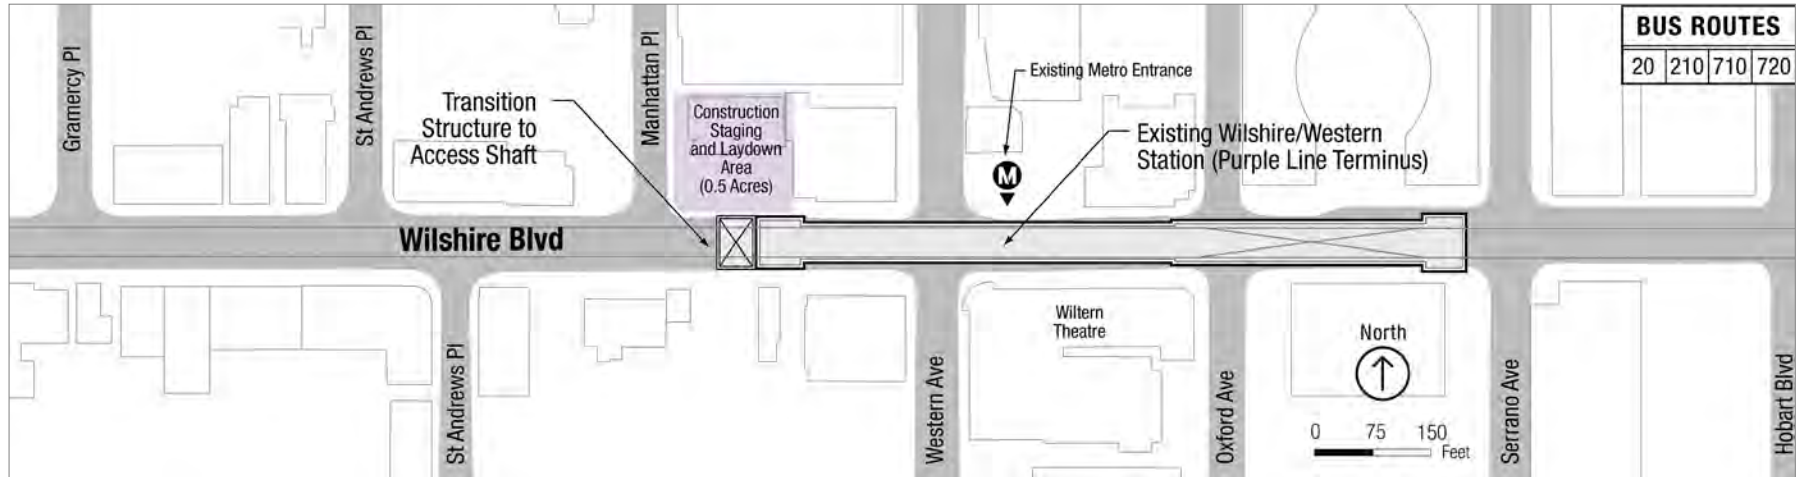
Wilshire/Western Station—Transitional Structure and Construction Staging and Laydown—North of Wilshire
